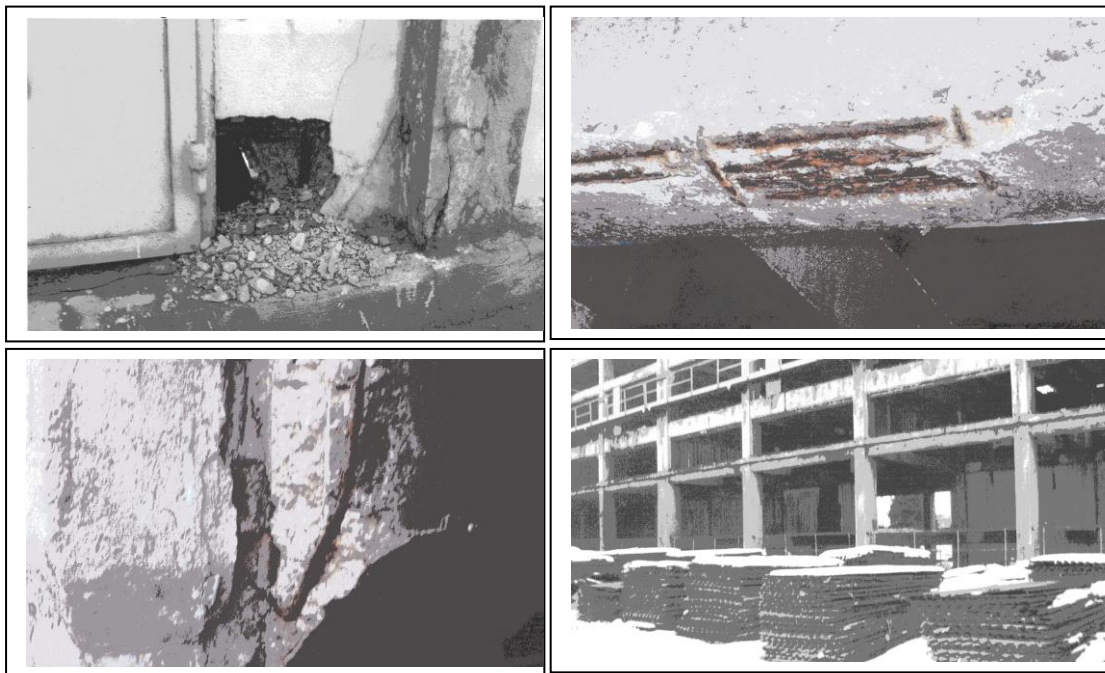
Cracks, corroded reinforcement, deterioration of the reinforced concrete members, corroded metal service bridge
